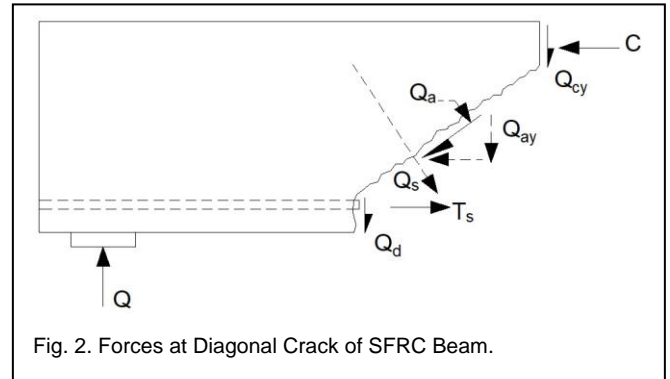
Forces at Diagonal Crack of SFRC Beam.
